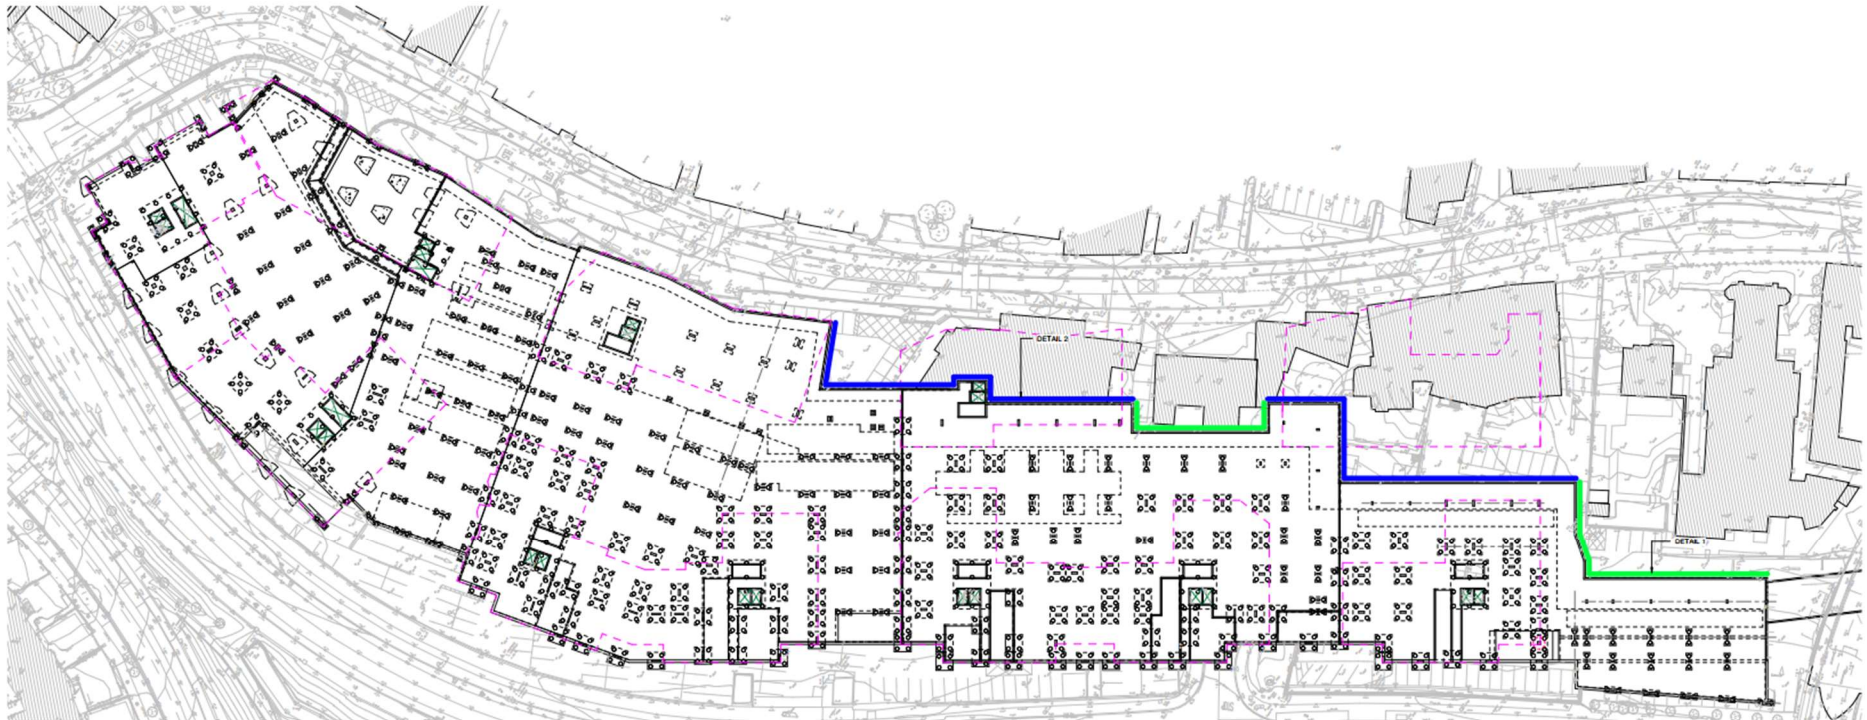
Proposed plan layout (TJOC, Dwg titled “Foundations - retaining walls and piling layout)
